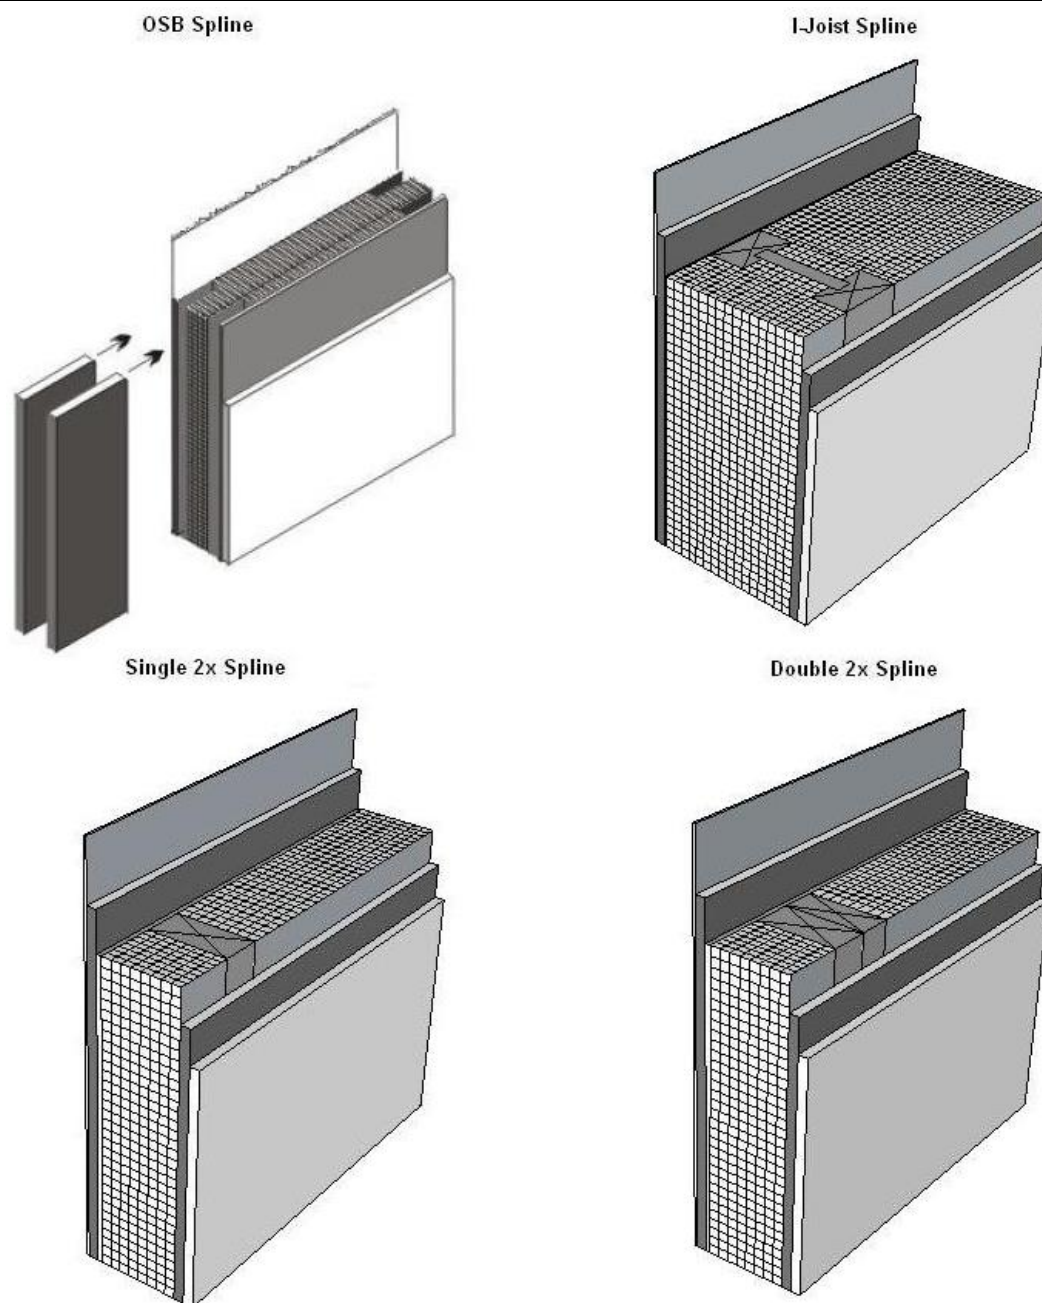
Structurally Insulated Wall Panels (SIPS)
